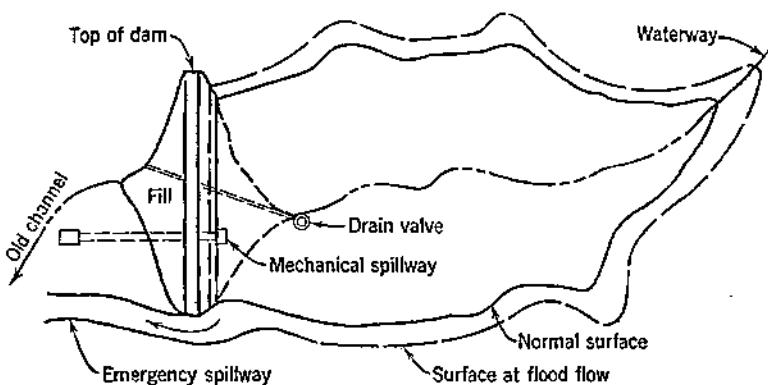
Plan view of typical surface-water pond, showing the drain, mechanical spillway, and the emergency spillway. (After Calkins³)
